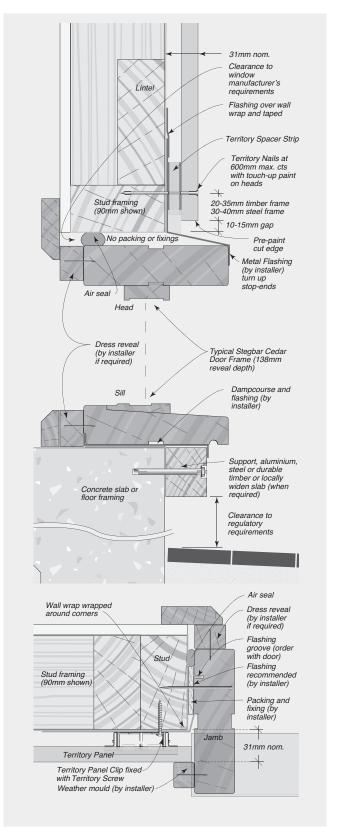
Typical Stegbar Sliding or Entry Door
